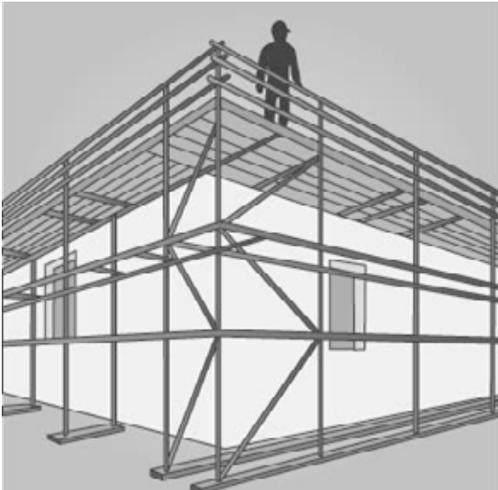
Perimeter scaffold with a fully decked working platform, guardrails and toeboards.
